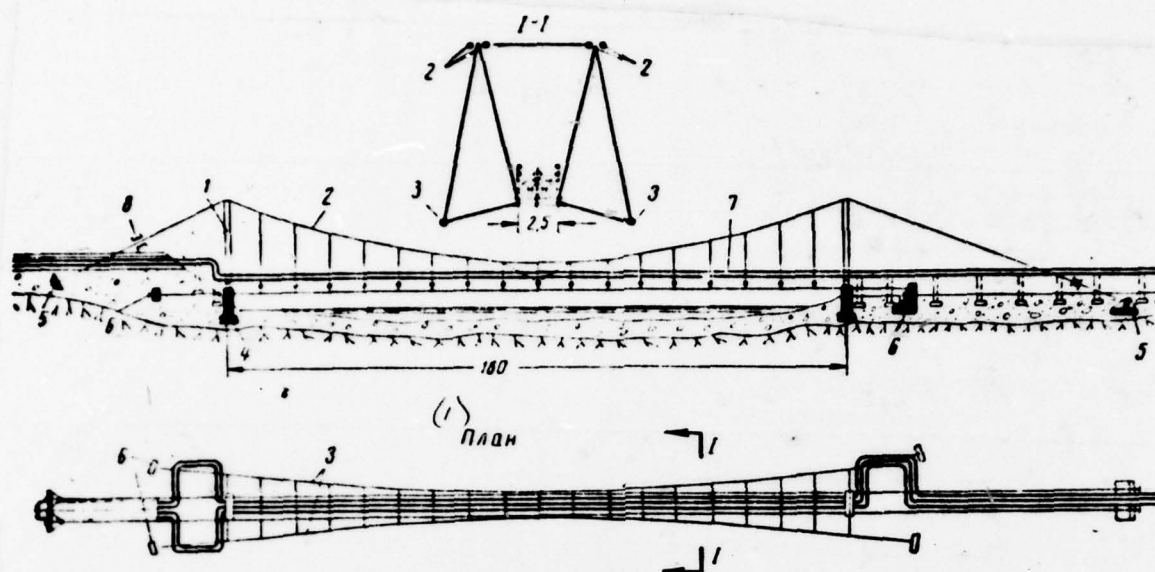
Transition of suspension construction. 1 - pylon; 2 - lift wires; 3 - wind cables; 4 - foundation of pylon; 5 - anchor pole of the lift wires; 6 - anchor poles of wind cables; 7 - pipelines; 8 - tightener.
